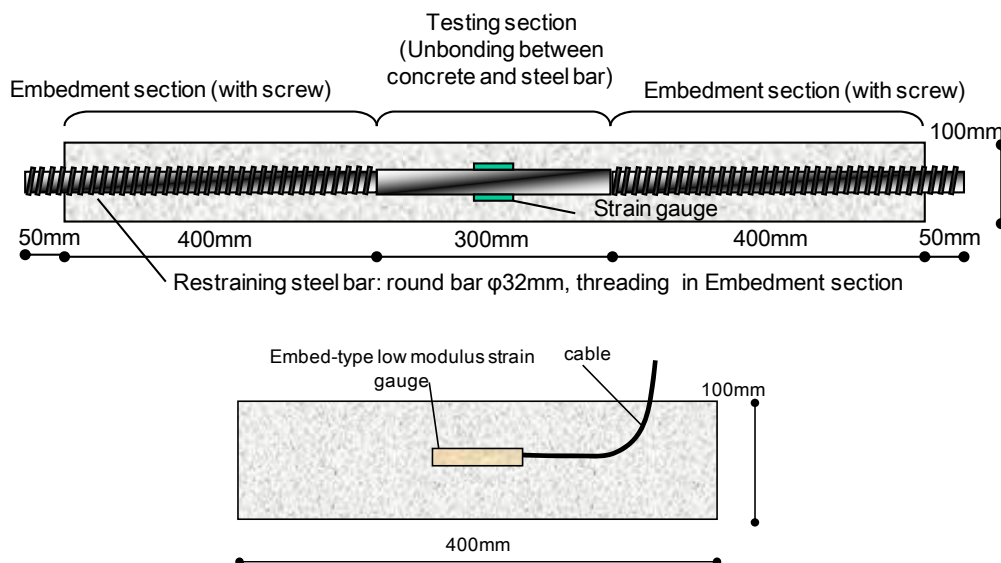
Specimen for the restrained shrinkage cracking experiment, upper: restrained cracking test specimen, lower: free shrinkage test specimen
